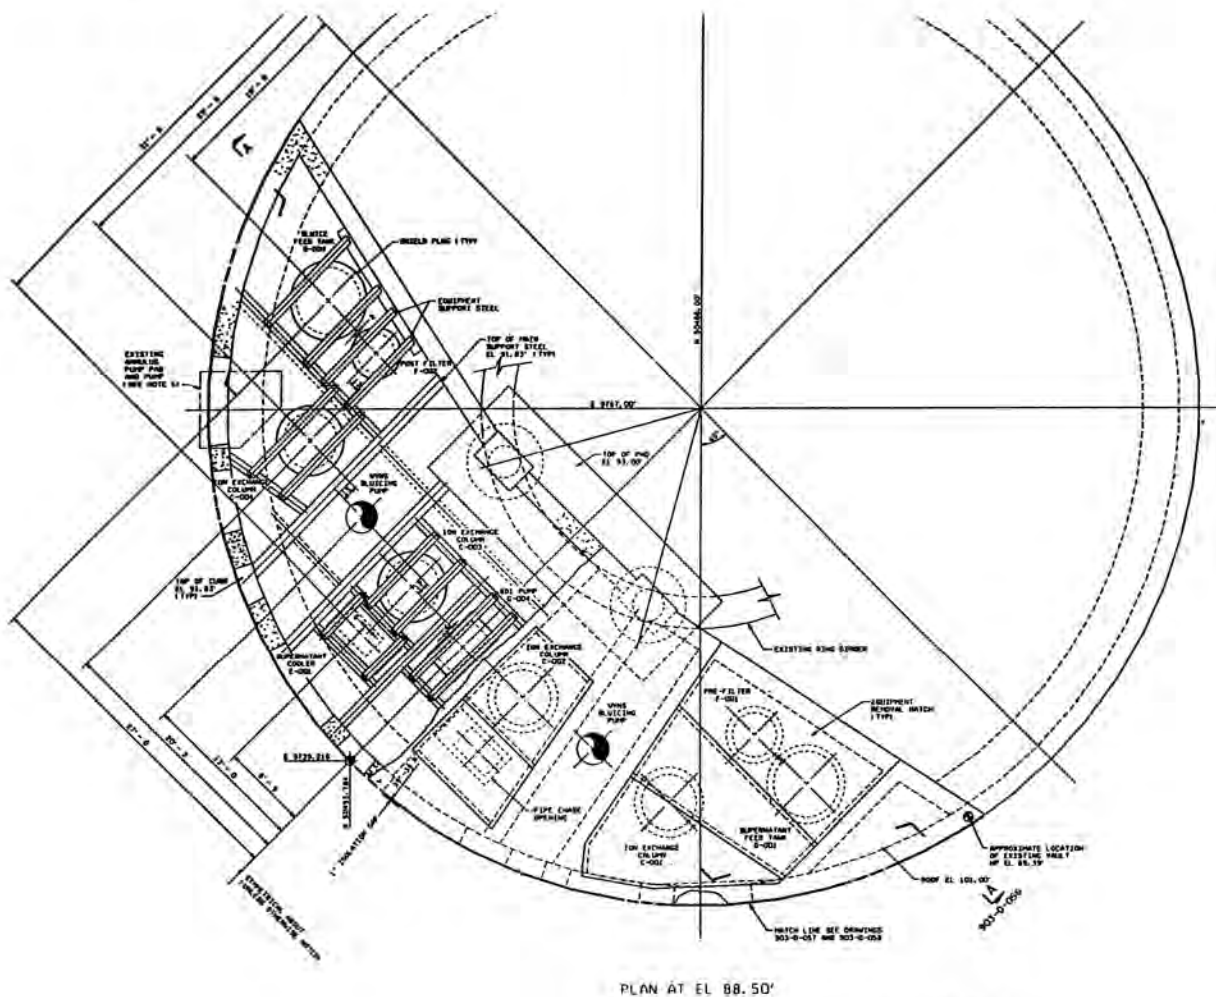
Plan View of Supernatant Treatment System Installation in Underground Tank 8D-1.
